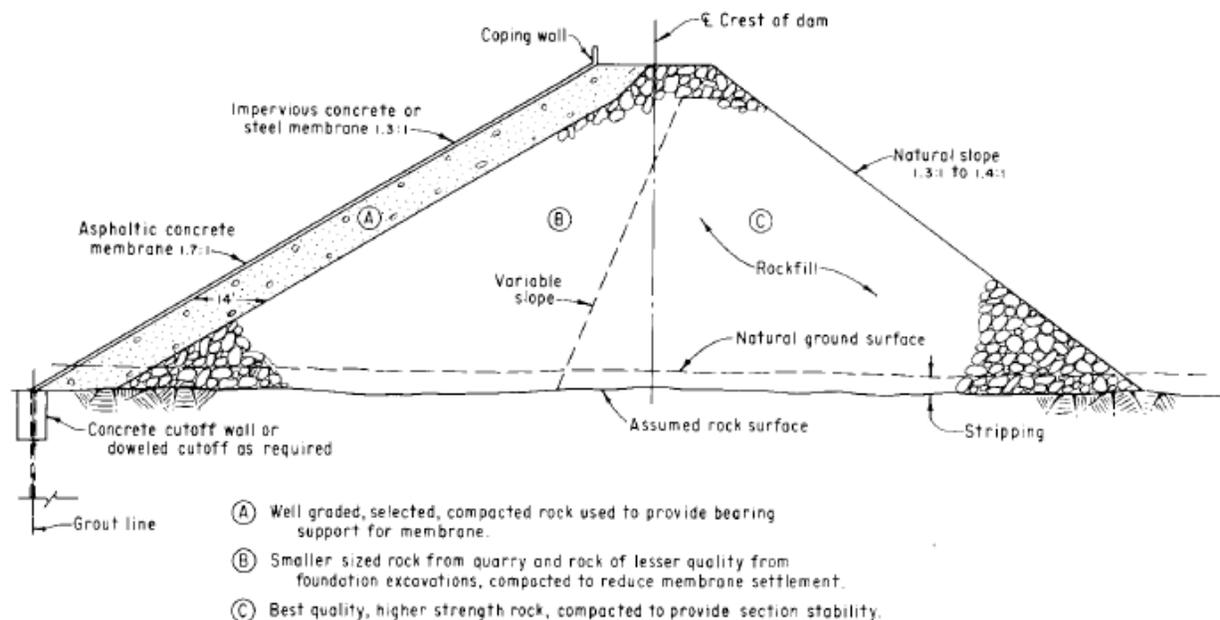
Typical maximum section of a decked rockfill dam. 288-D-2801.
